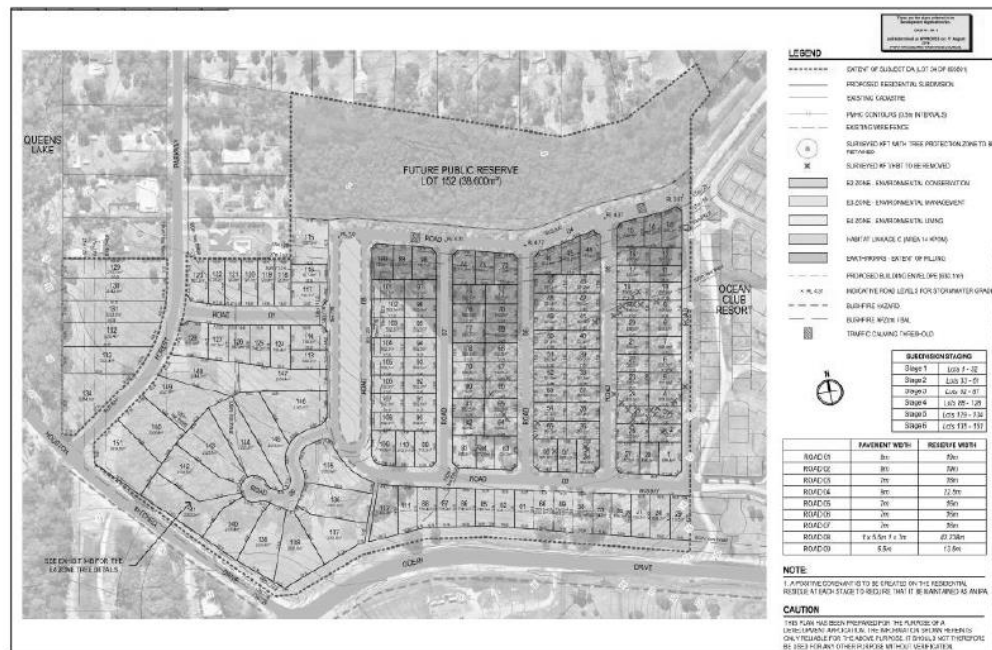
DA 2016/88 Original Subdivision Layout Approval – Extract
